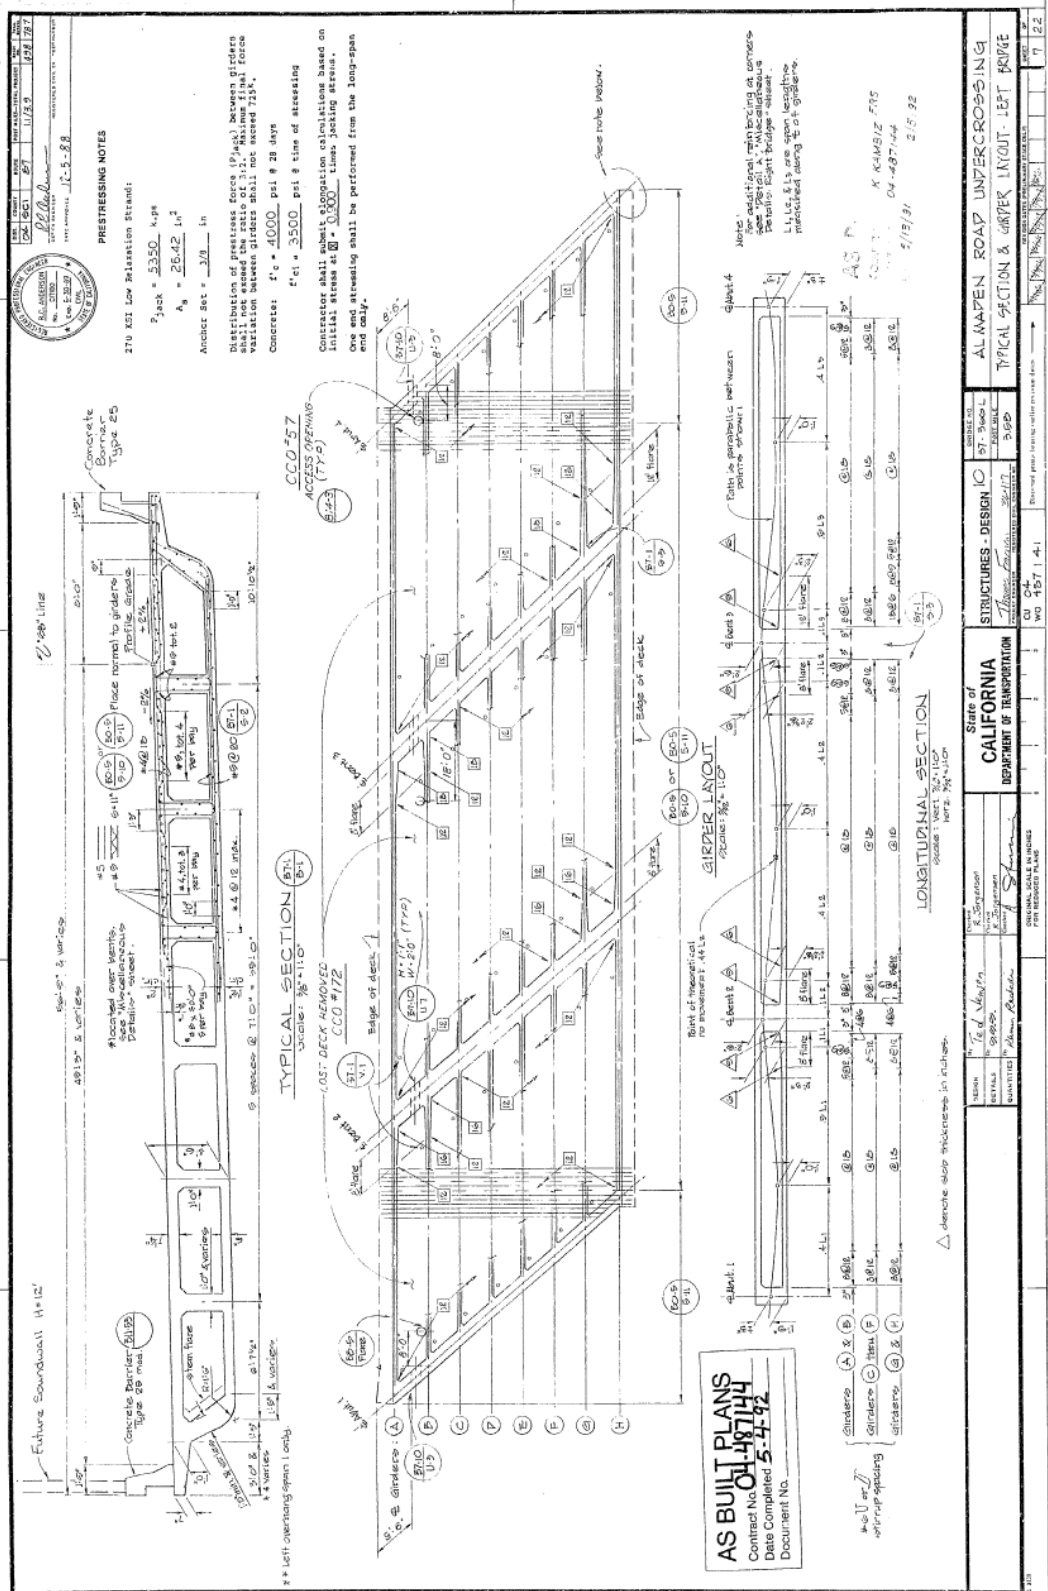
Cross-section and prestressing details of bridge 37 0366L
